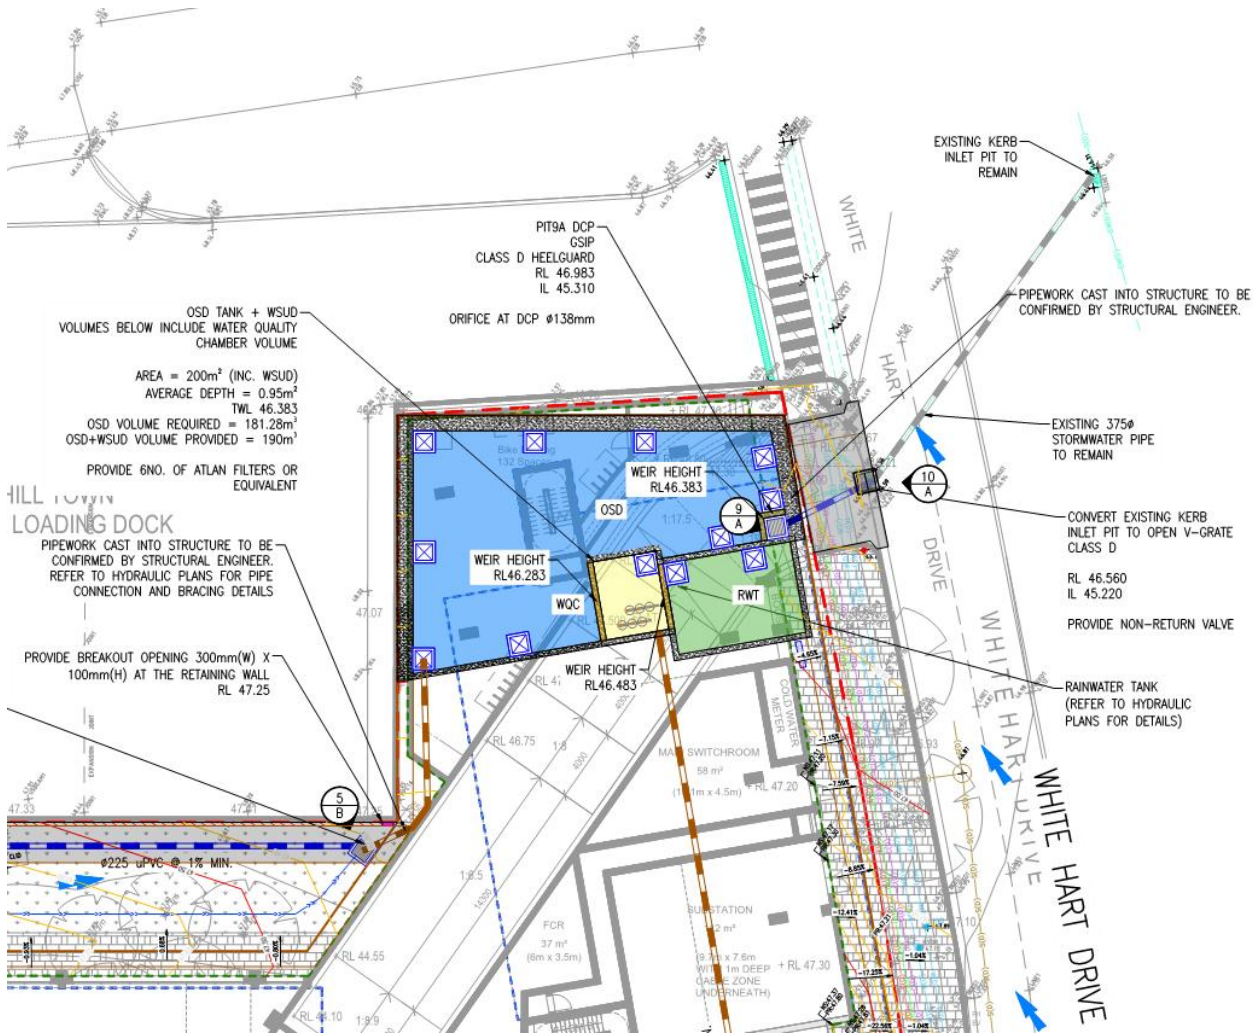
Proposed Concept Drainage Design Layout (Refer to Appendix A for more detail)
